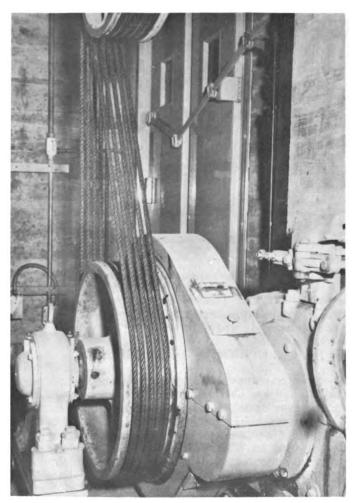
Basement drive elevator hoisting machine—Fontana.
